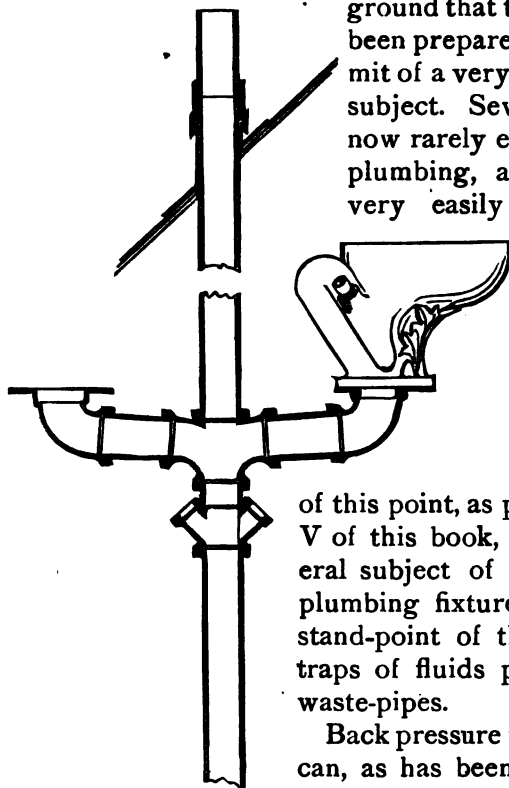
Stack supporting Closet. Roof Connection at top of Stack.
